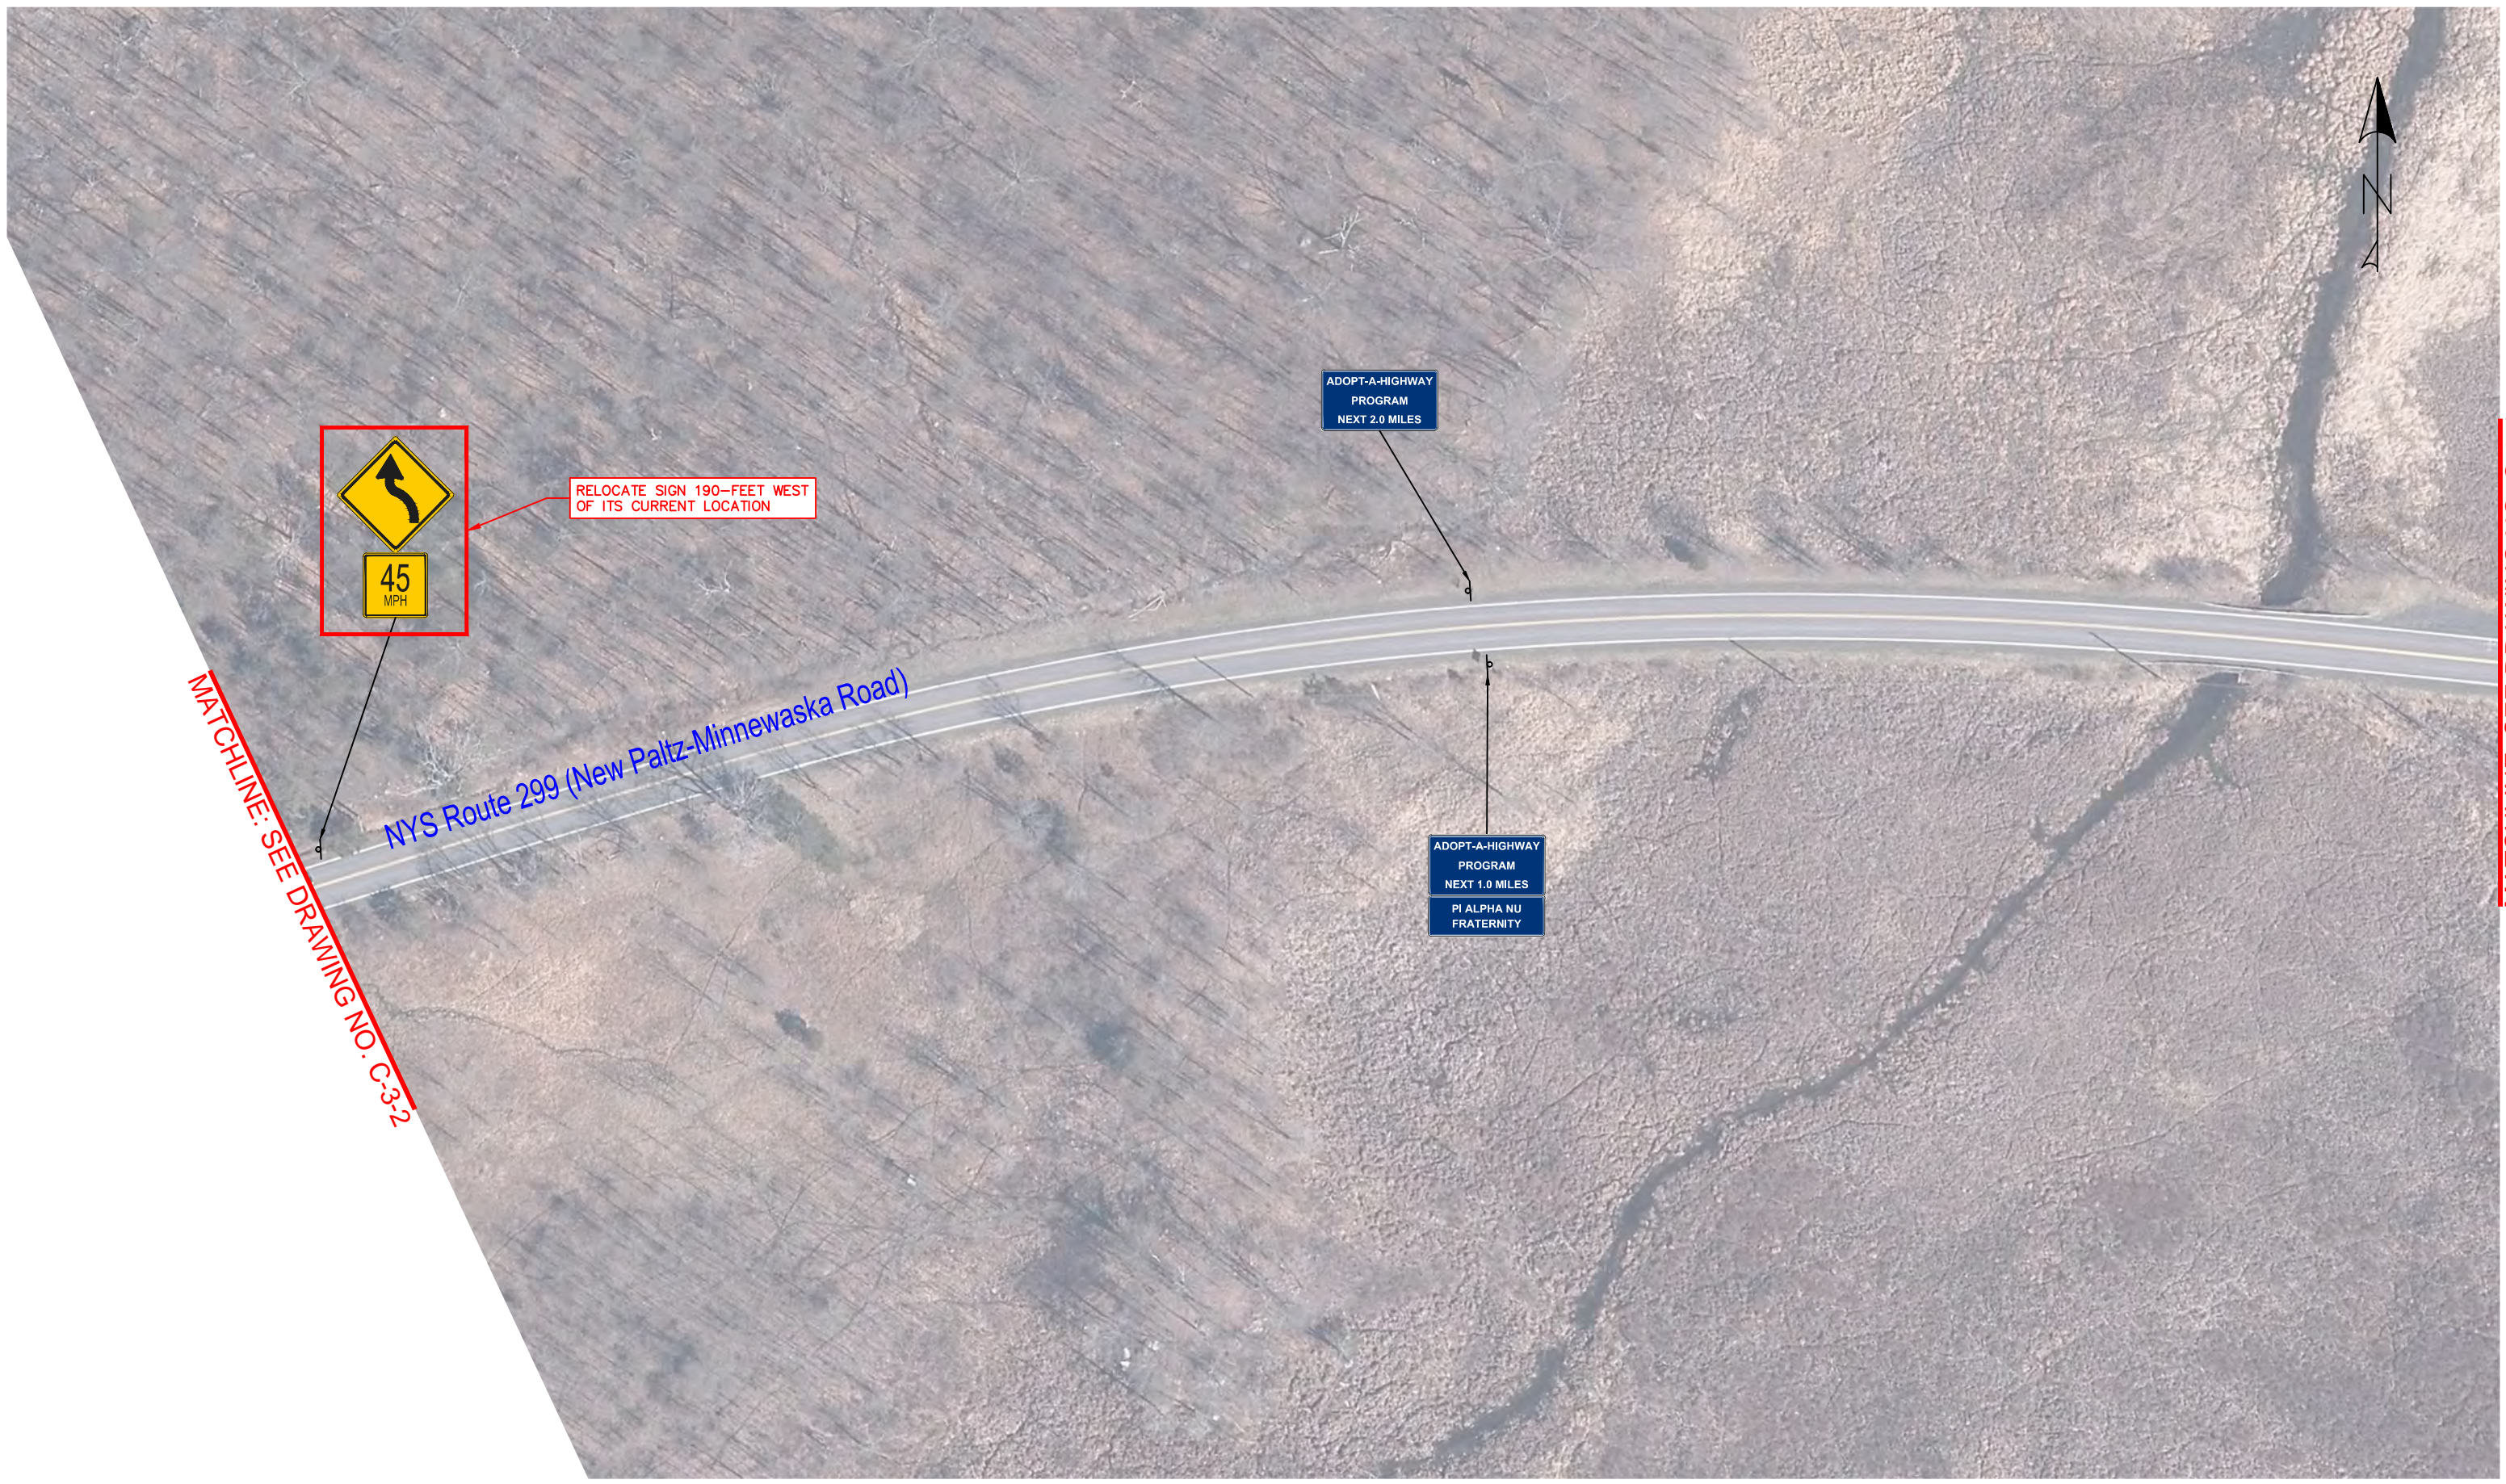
NEW PALTZ CONCEPTUAL IMPROVEMENT PLAN
